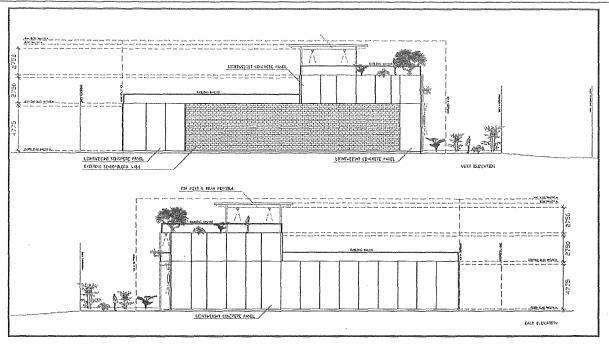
Proposed West and East general views of the expanded light industral facility proposed for 1036 Seamount Way, Gibsons, BC. Source: Joe Oteruelo.
